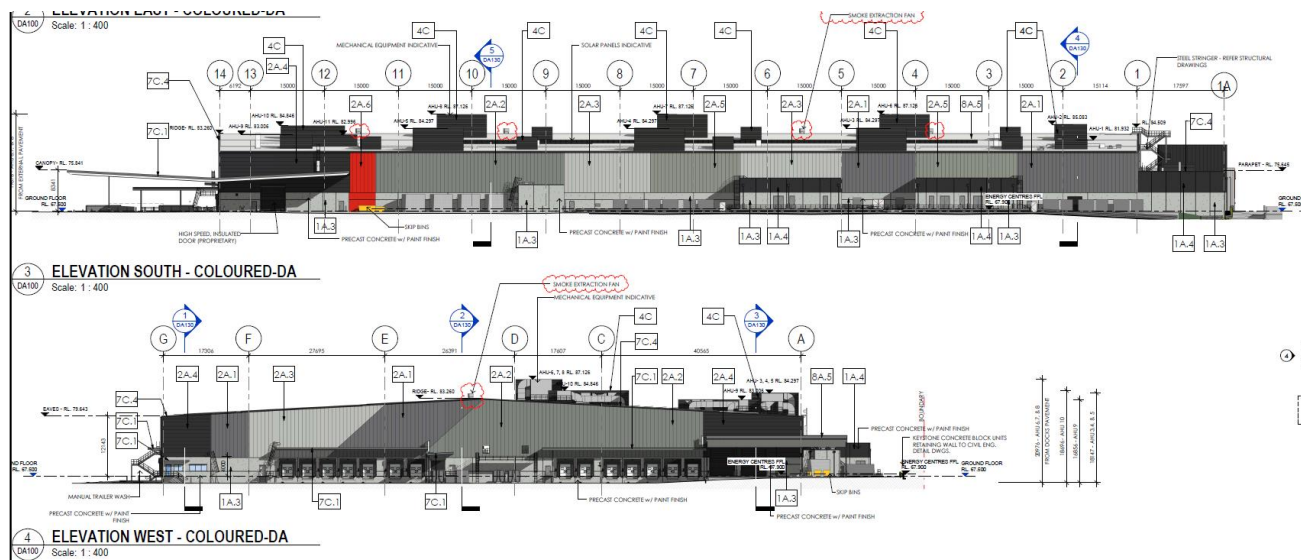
Proposed Elevations (South and West) – SSD-10404-Mod-1
